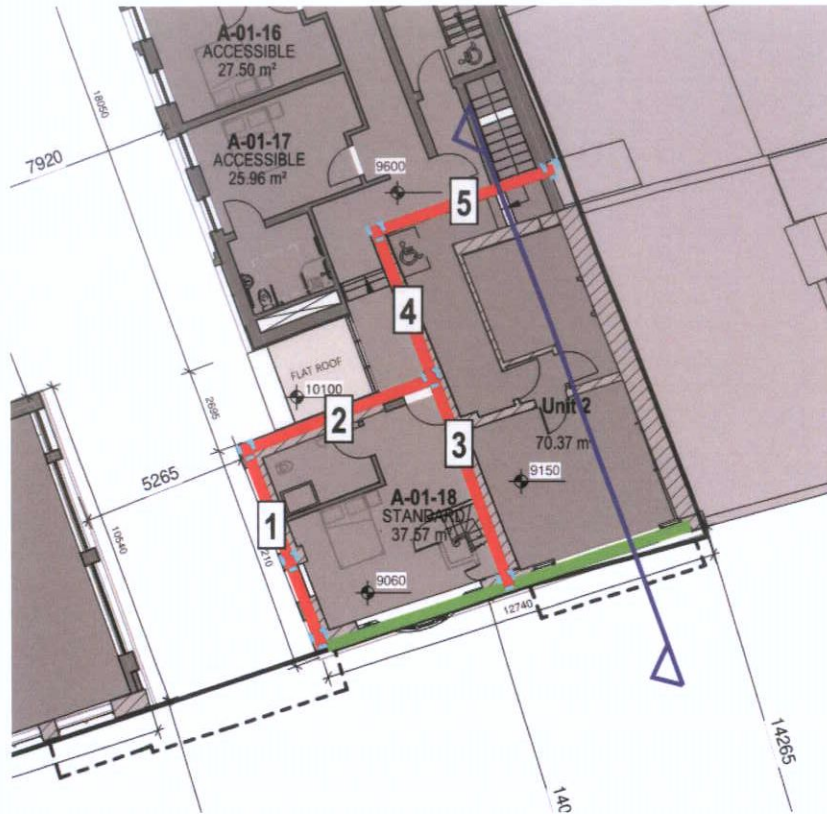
36-37 Henry Street New Steelwork Layout 1st Floor
